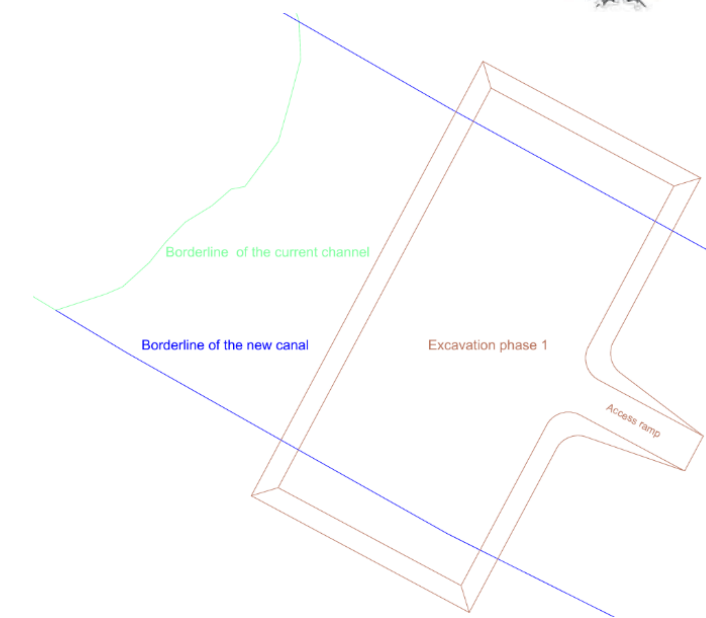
Work area, access ramps and borderlines of current and new channel [Own elaboration]
